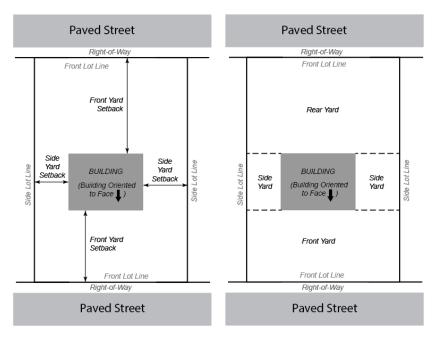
F: Typical lot lines and setback locations for a double frontage (through) lot (left image) and typical yard locations (right image). Please note the location of the rear yard for the purpose of accessory use location.
